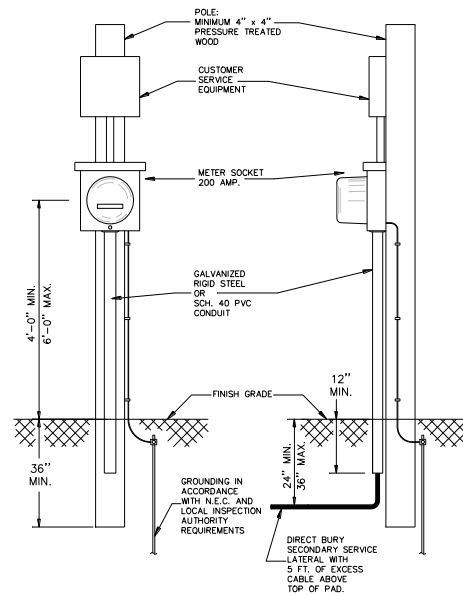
A – TYPICAL UNDERGROUND TEMPORARY SERVICE
